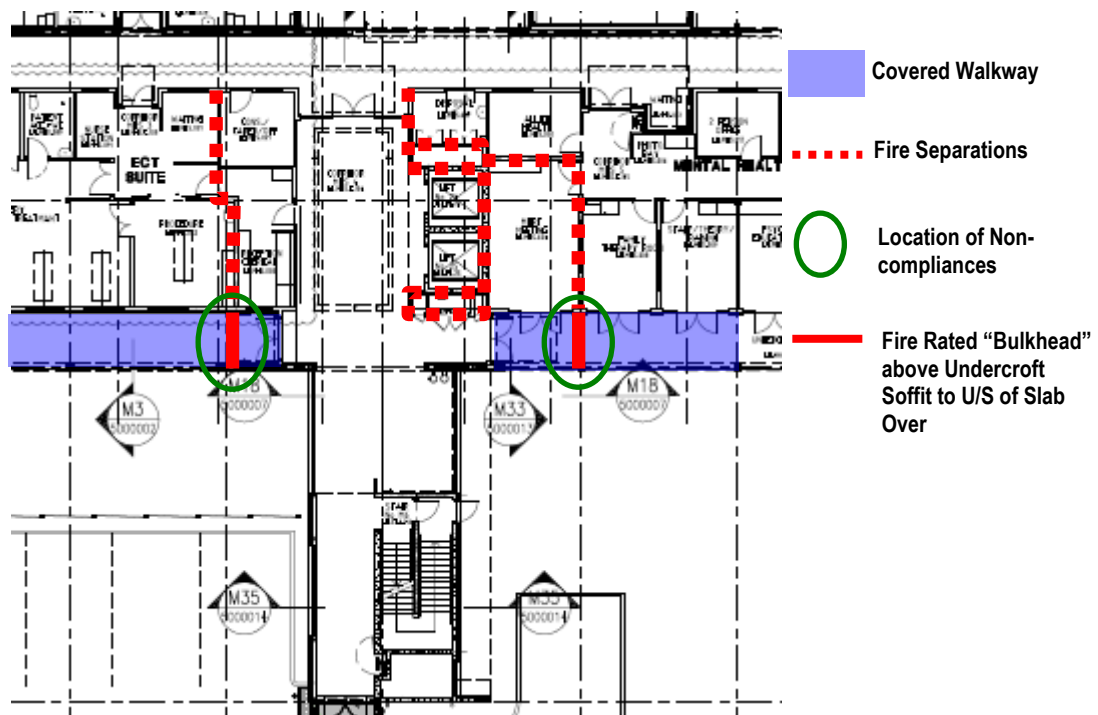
Level LG floor plan showing areas where extended fire separation is required (adapted from part drawing PSH-AR-MEH-DWG-20LG100)
